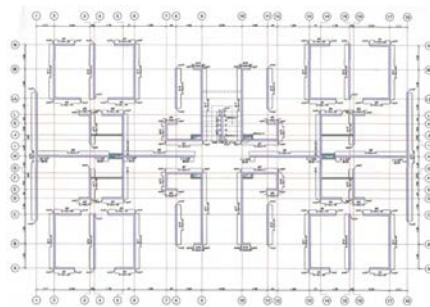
Plan of a typical building. Photo courtesy Alvaro P
